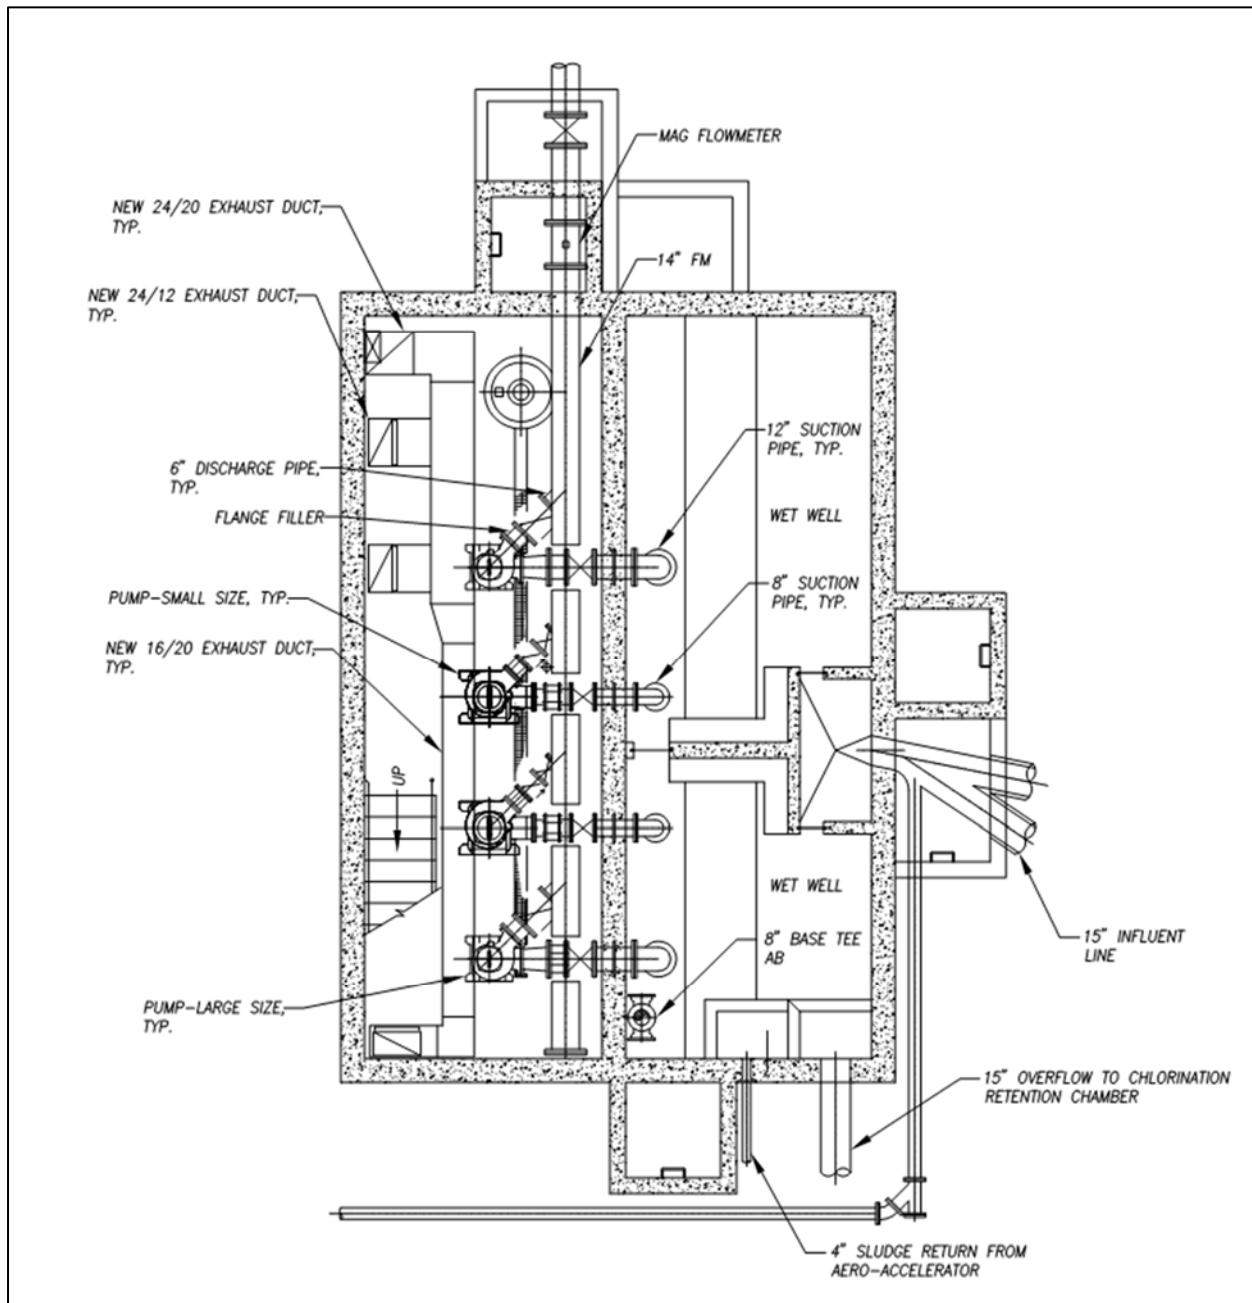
IPS Proposed Layout – Pump Room Floor
